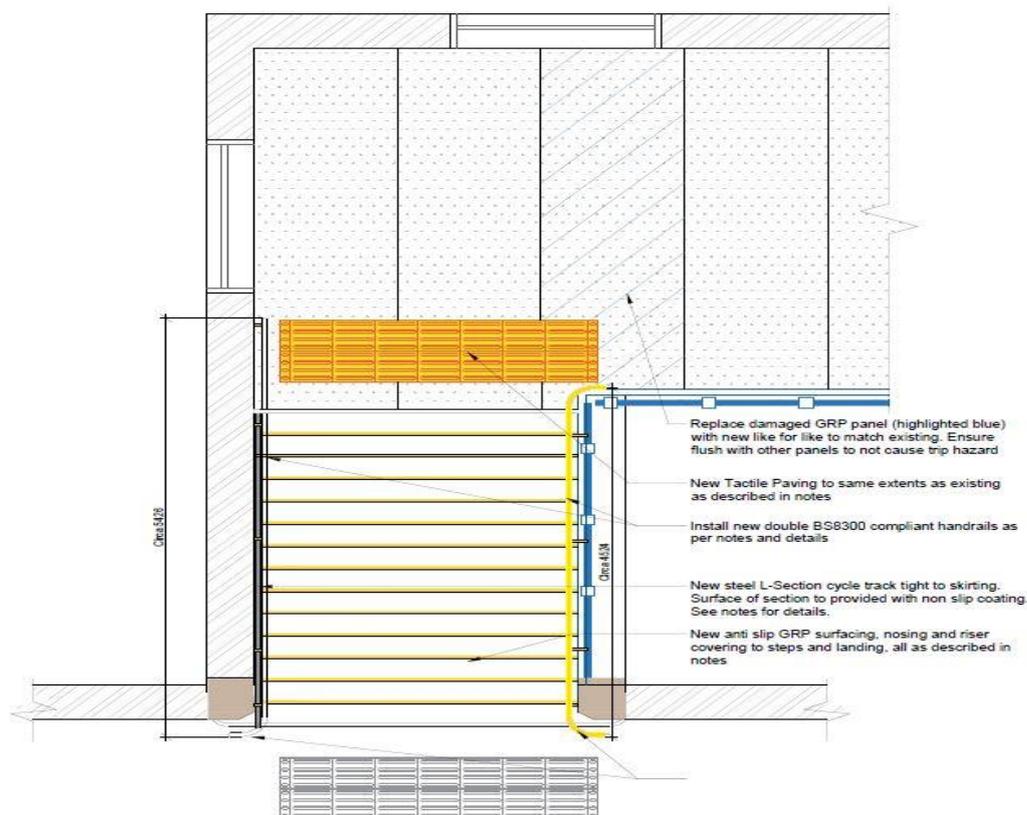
Proposed plan of new installations of handrails to stairs from Ticket Office
